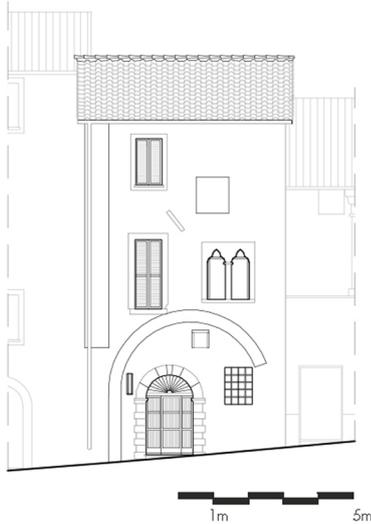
Arcaded houses in via del Colle and Piazza Trani.
